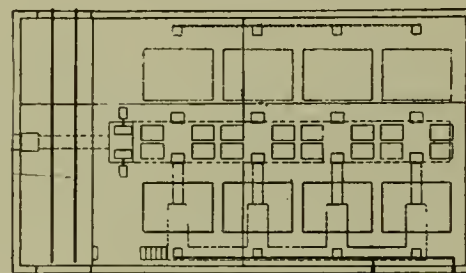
FLOOR PLAN, PITTSBURGH REDUCTION CO.
